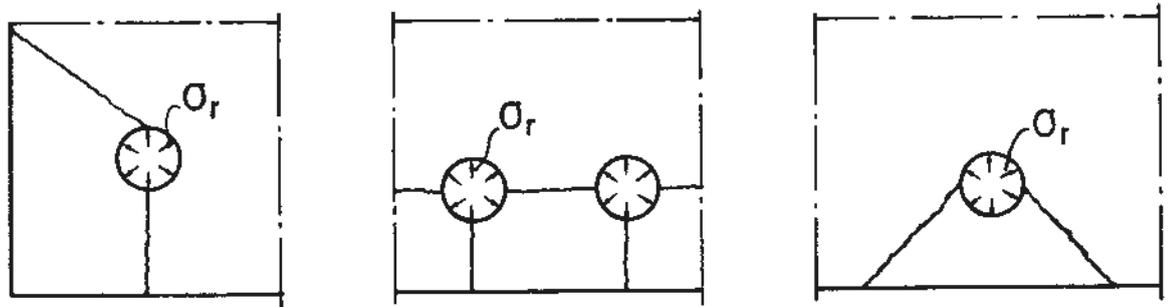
Examples of different possible crack patterns at anchorage failure due to splitting (splitting failure)
